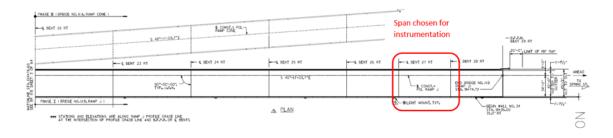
Engineering Drawing. Plan view Span 27RT, Bridge 11B
